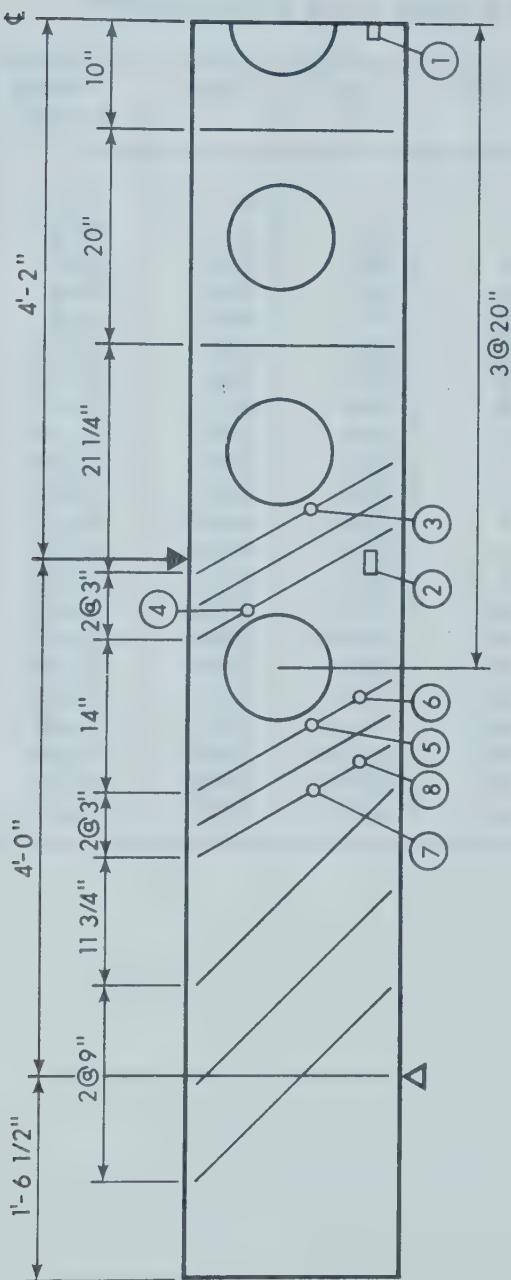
BEAM AD-11 REINFORCEMENT AND GAUGE DETAILS
